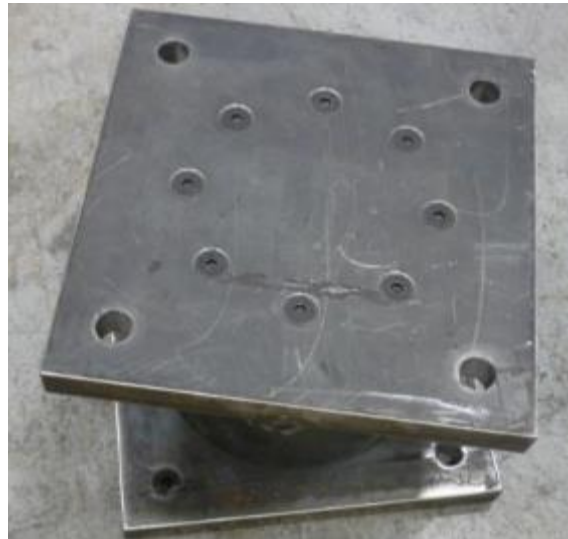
Misaligned grooves in top and bottom bearing plates of the bearing MA4
